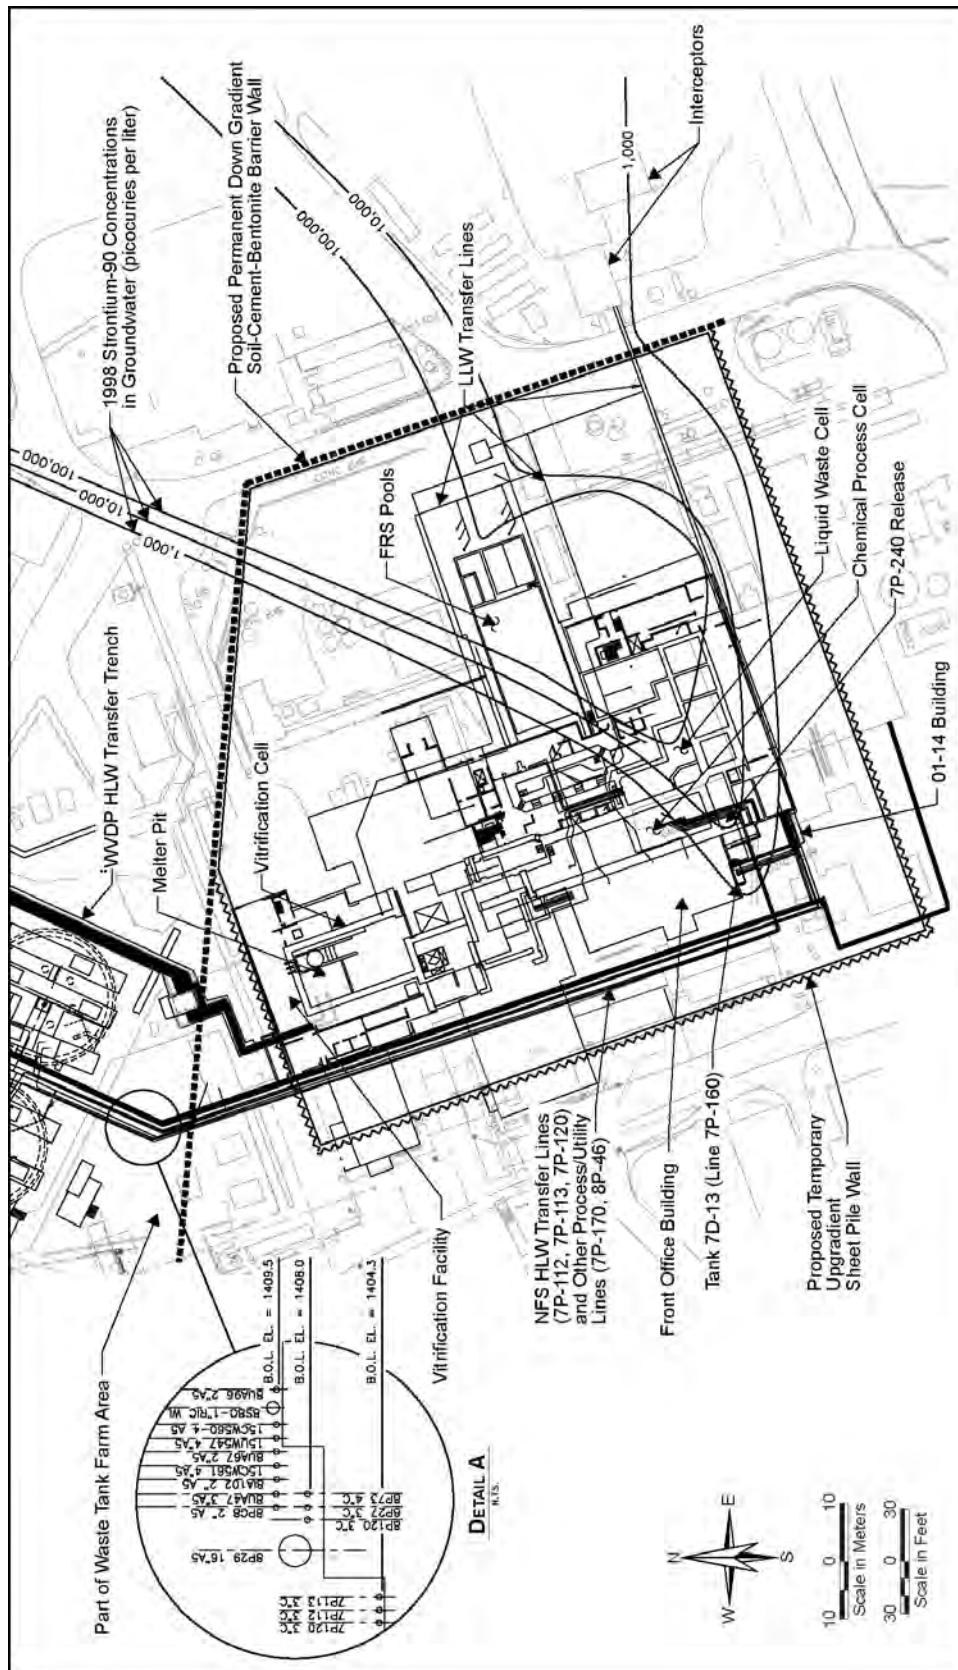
Conceptual Layout of Waste Management Area 1 Excavation
